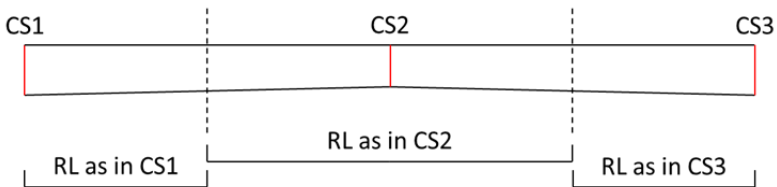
Distribution of reinforcement along the deck. Red lines indicate design cross-sections, while dotted lines are placed at equal distance from two consecutive design cross-sections. CS = cross-section, RL = reinforcement layout.
